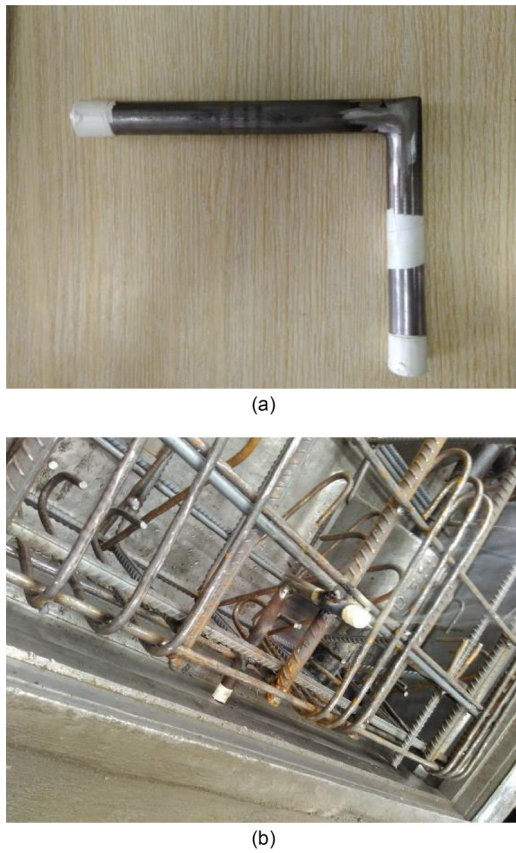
Water pipes: (a) temporary sealing treatment of water pipe; (b) welding of water pipes to the reinforcement cage
